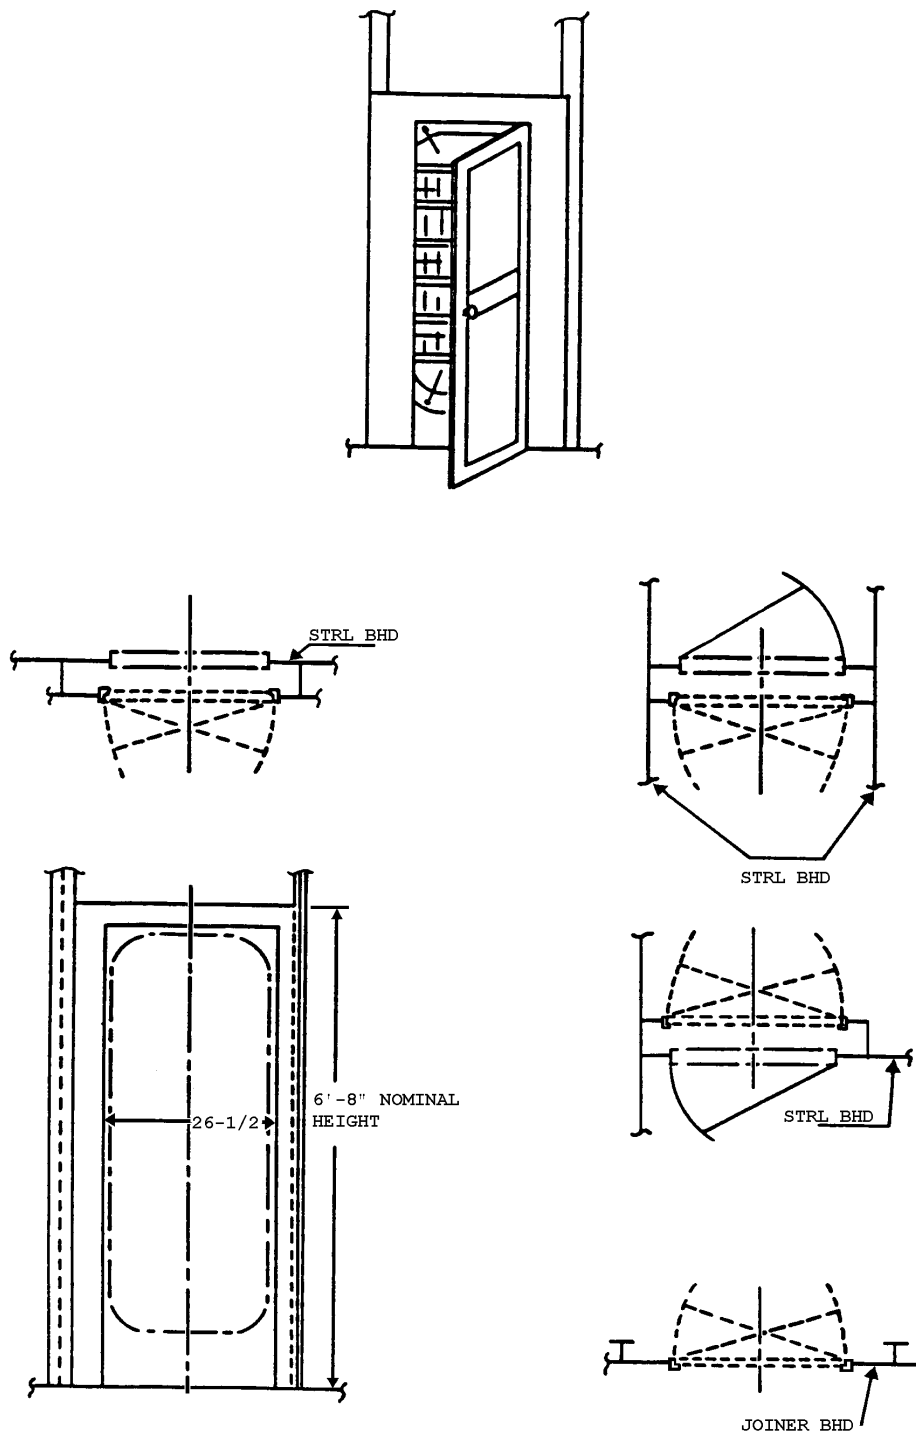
Typical A\C Boundary Door Arrangements METAL JOINER DOOR TYPE "HS"
